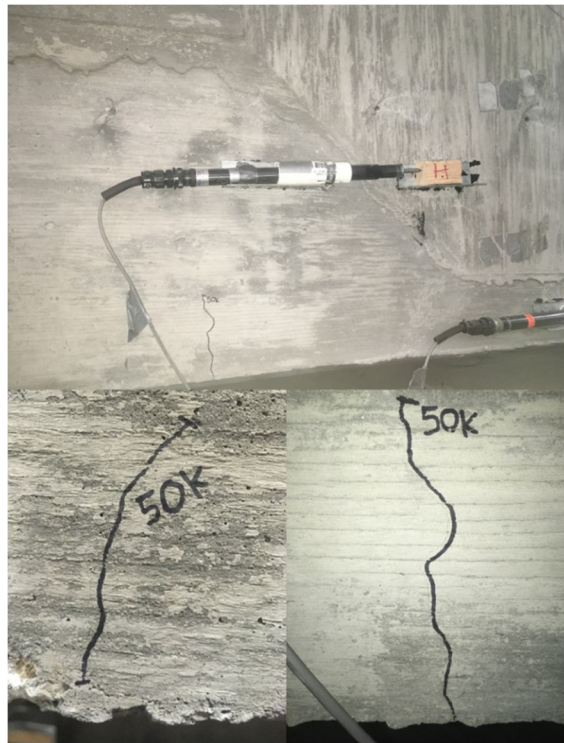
Welded connection failure test - first cracking at 50 kips
